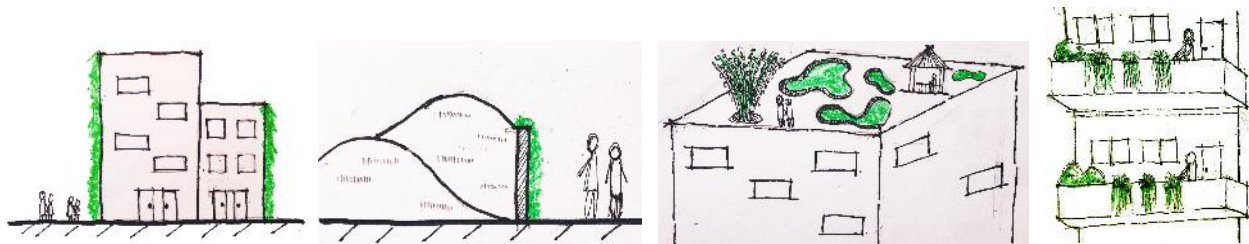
Vertical greening on a building façade (left 1); VG on a wall (left 2); VG on a building’s roof (left 3); VG on a balcony (left 4)
